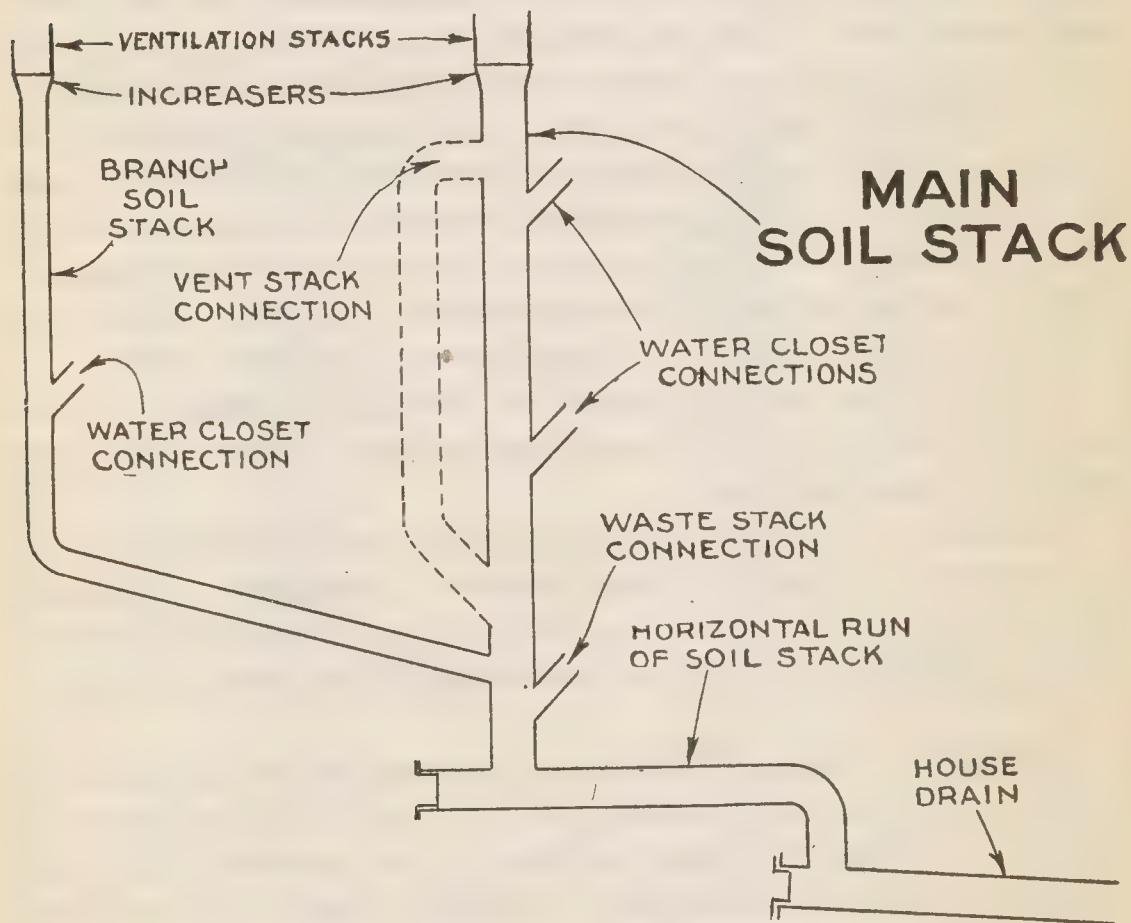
,652.—Main and branch soil stacks and their connections. Avoid horizontal runs if possible, but when they must be installed, provide clean out as shown.
